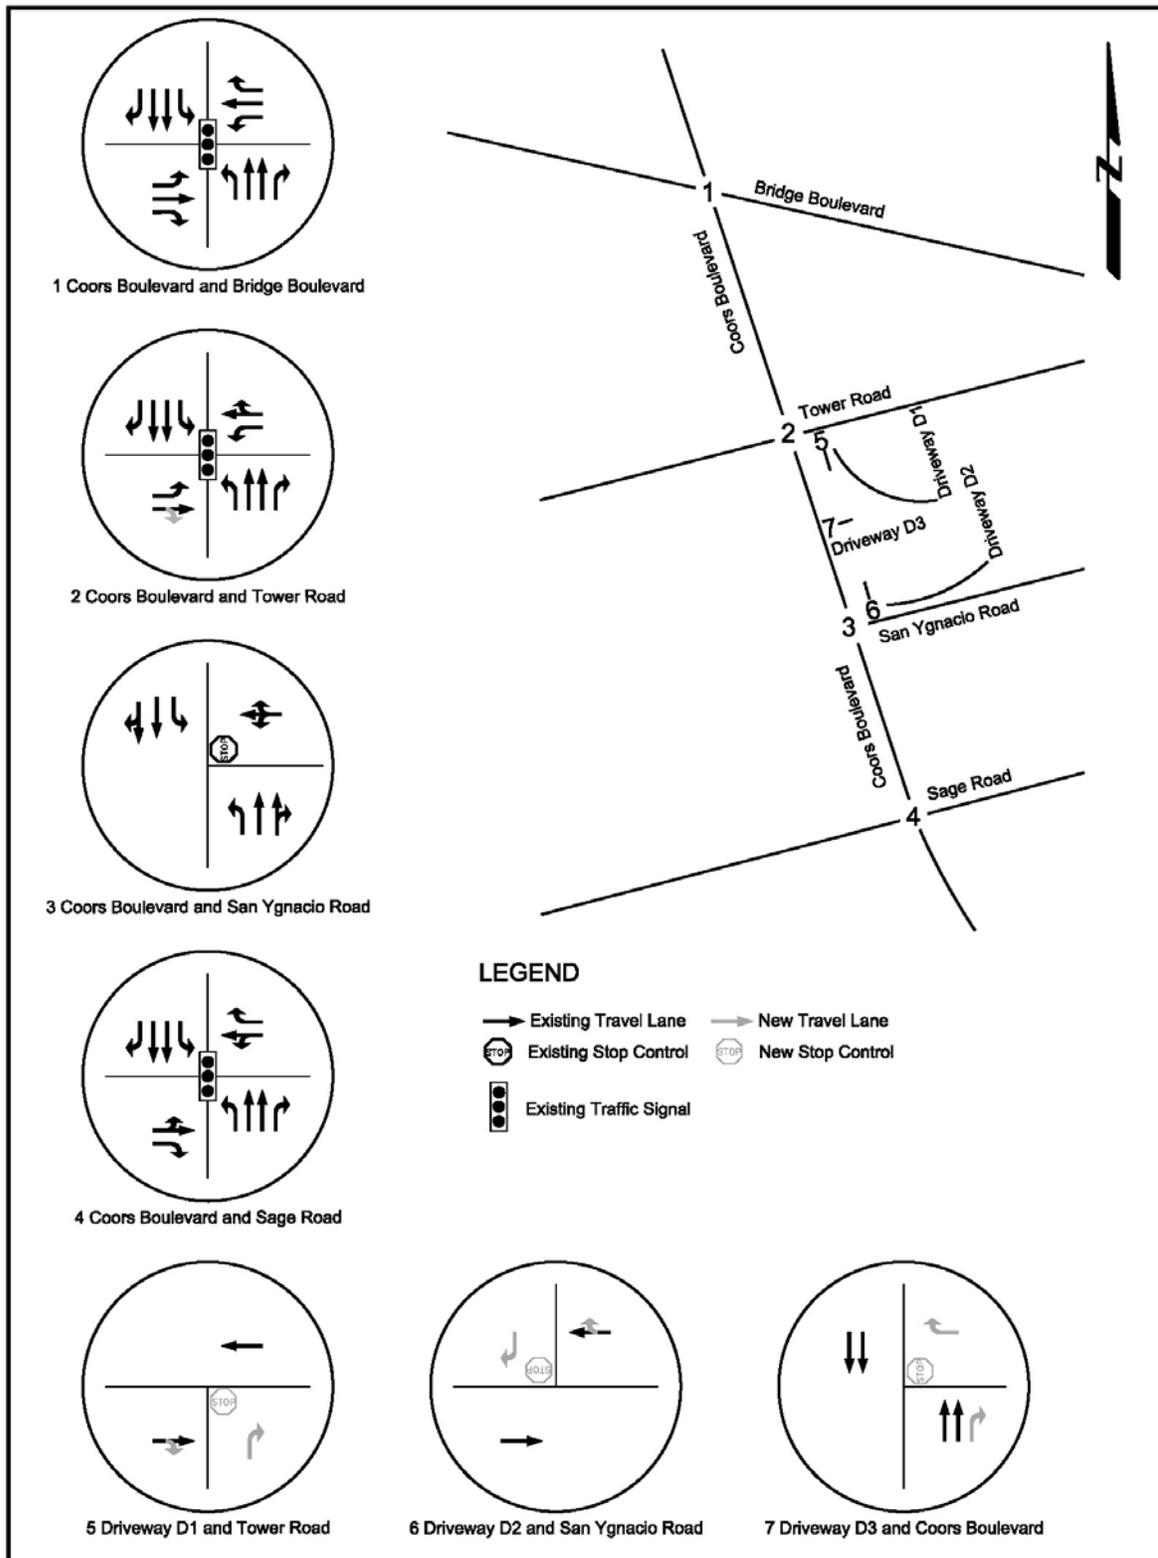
Lane Configuration and Intersection Control (Existing and New Improvements).
